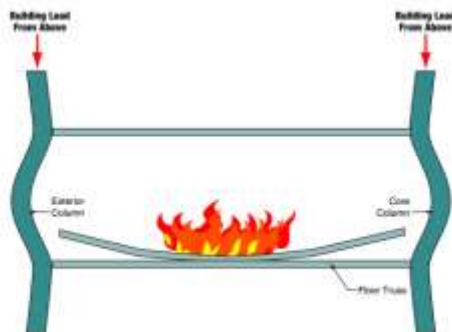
Buckling of columns induced by failure of floor framing and connections.
